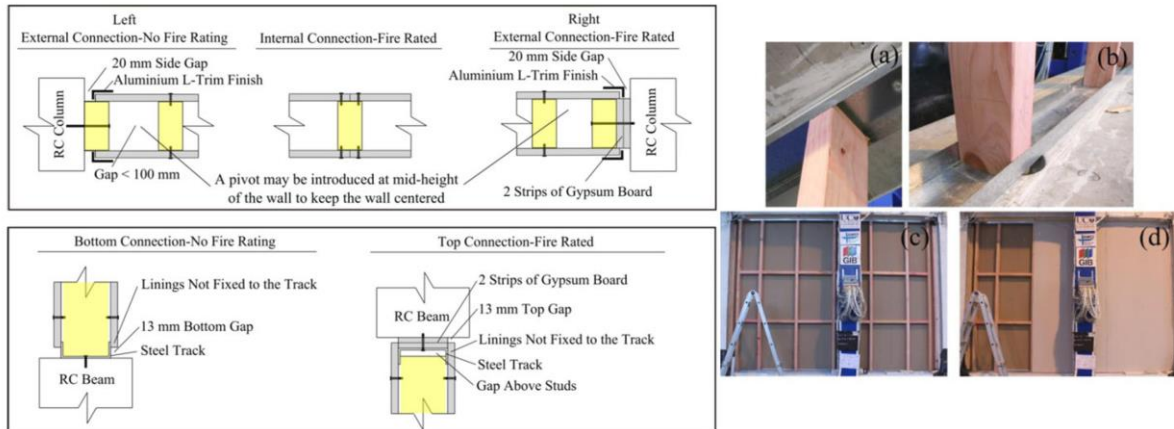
Adopted details in the low damage timber framed drywall specimen from study by Tasligedik *et al.* (2015): (a) & (b) friction fitted studs in steel channels, (c) completed frame system after the gypsum lining on the back was attached, and (d) attached linings.
